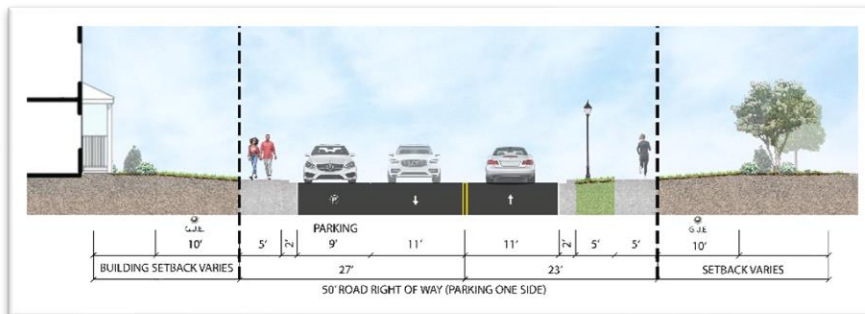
Typ. Neighborhood Road Sections (Appx. Exhibit 11.2)
